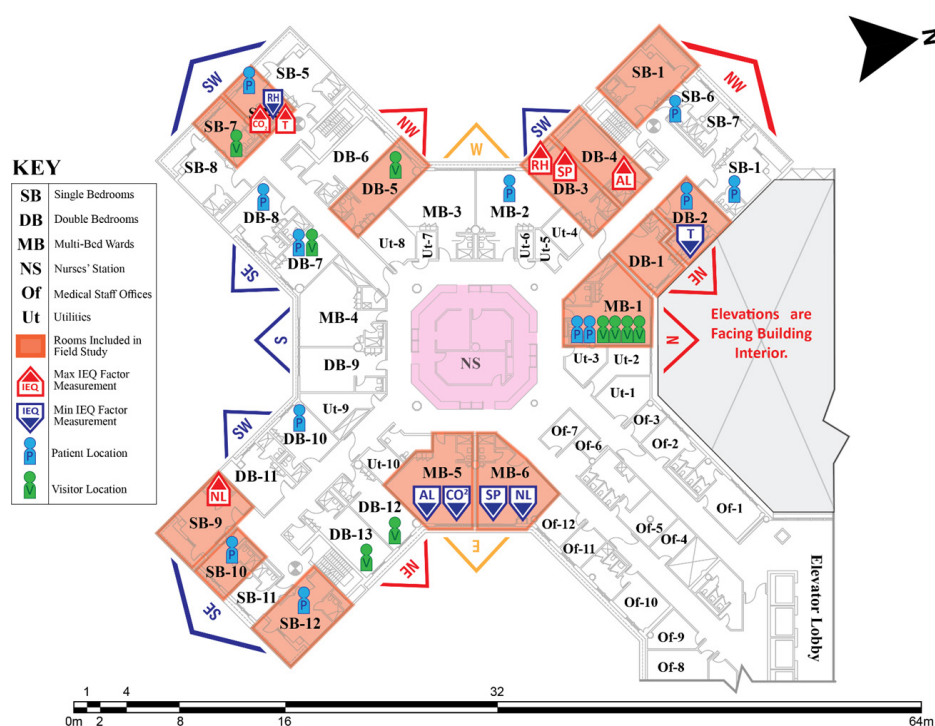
Typical non-intensive ward floor layout with added key information (Author, 2024).
